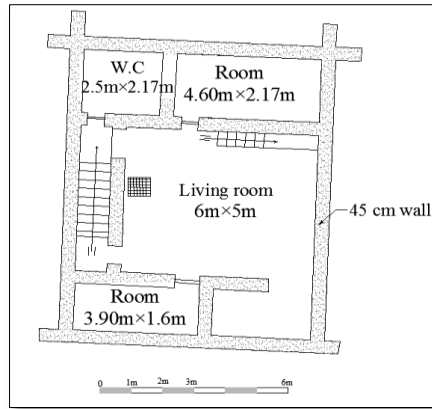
First floor plan of Abdulsalam Ali house in Ghadames.
